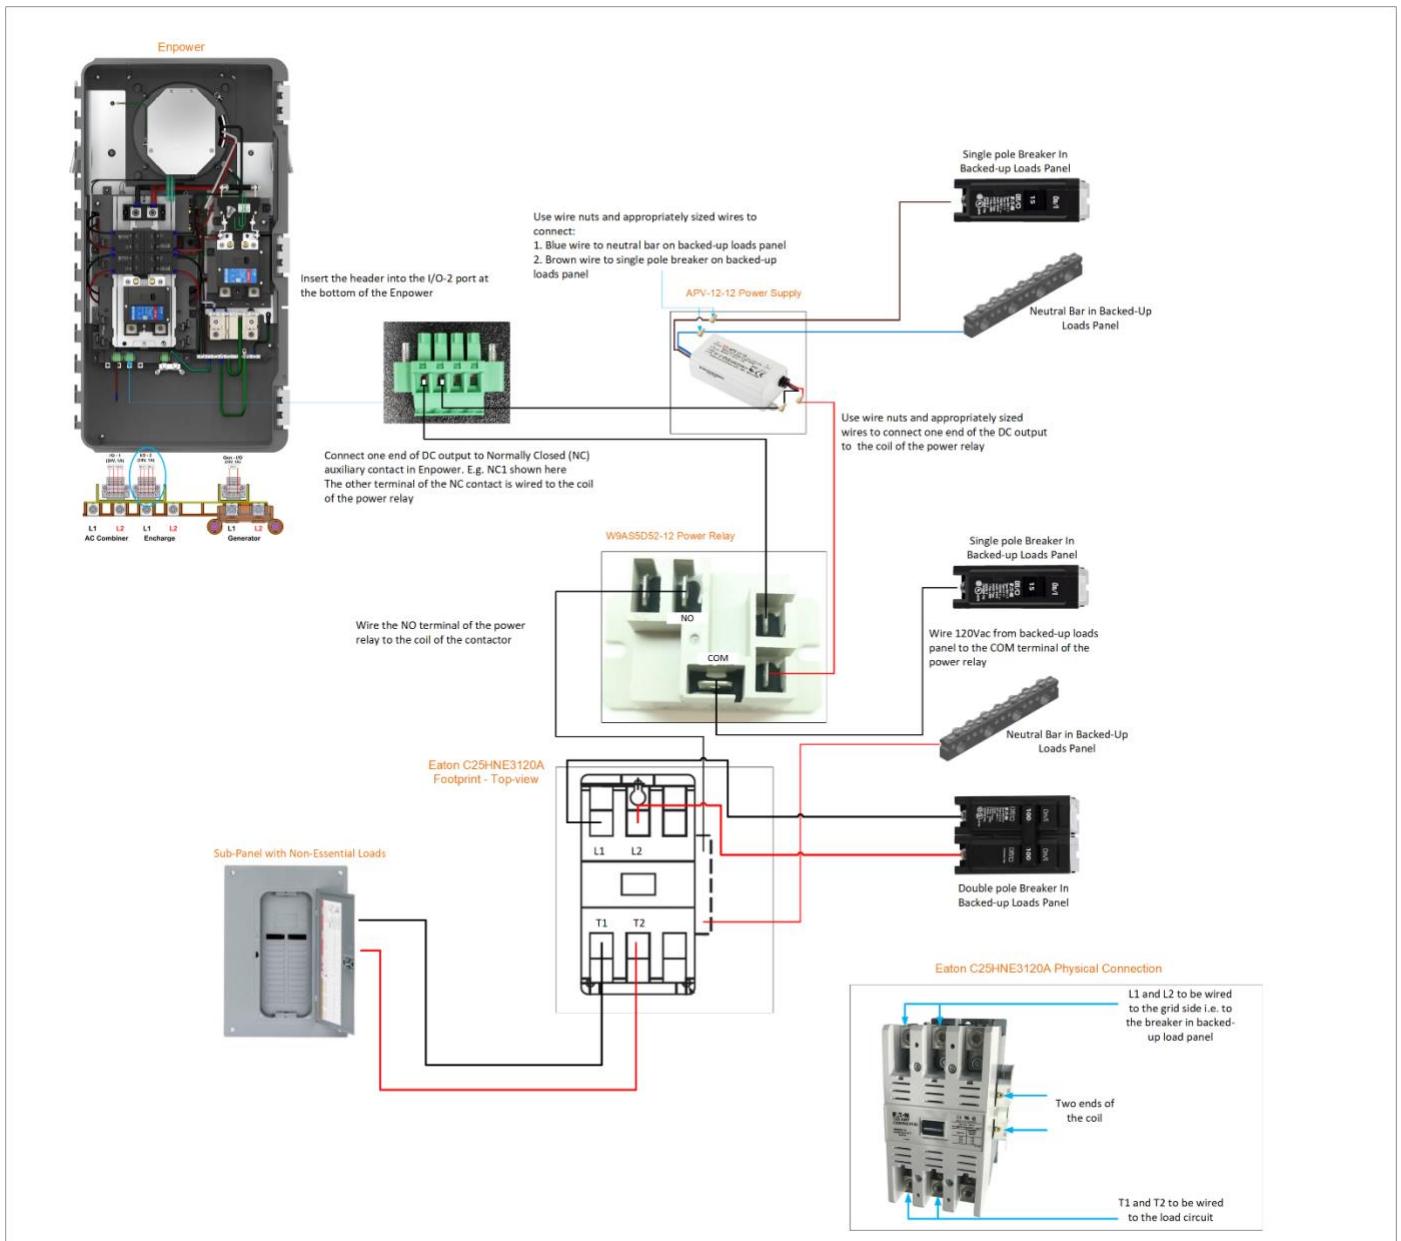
Example wiring: Load shedding using definite purpose contactor with 120 Vac coil
